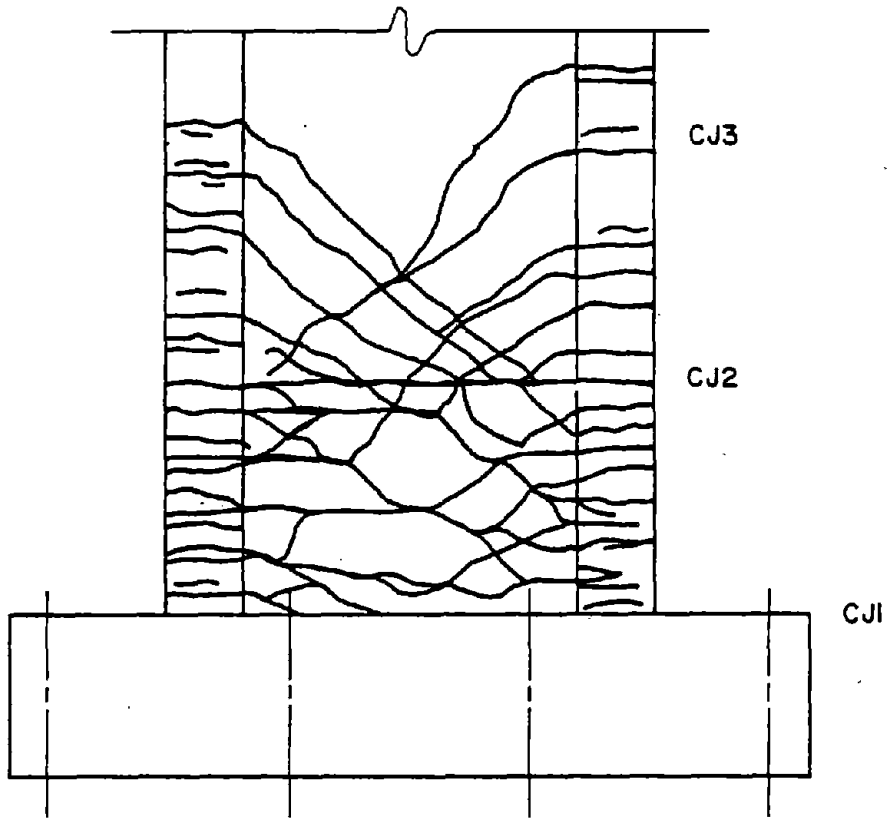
Crack Pattern in Lower Portion of Specimen B3
